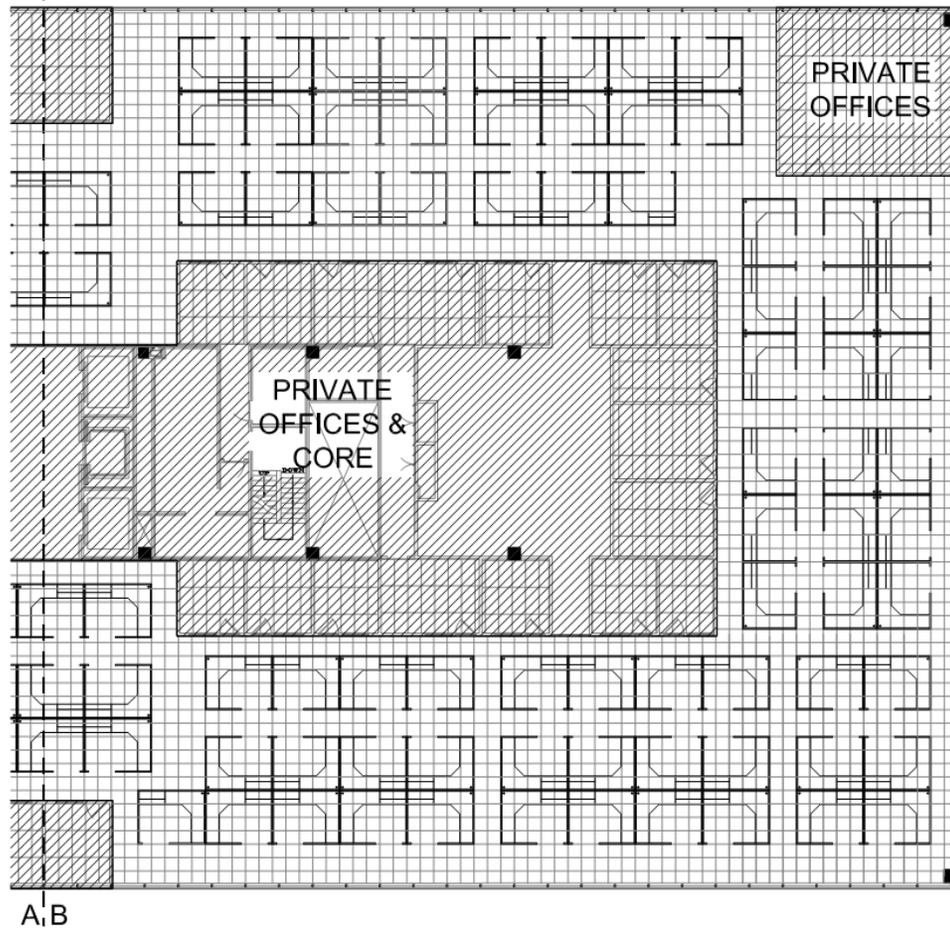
Small Office Prototype Reflected Ceiling and Floor Plan
